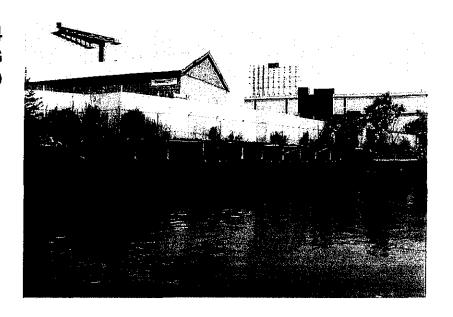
STEEL BULKHEAD HOLES NEAR SOUTH END
